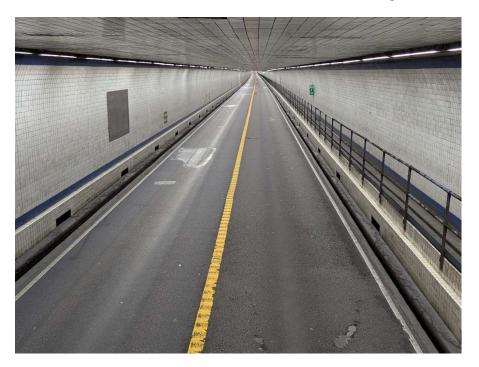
Tunnel Roadway – General View along Tunnel Roadway (Looking South)
